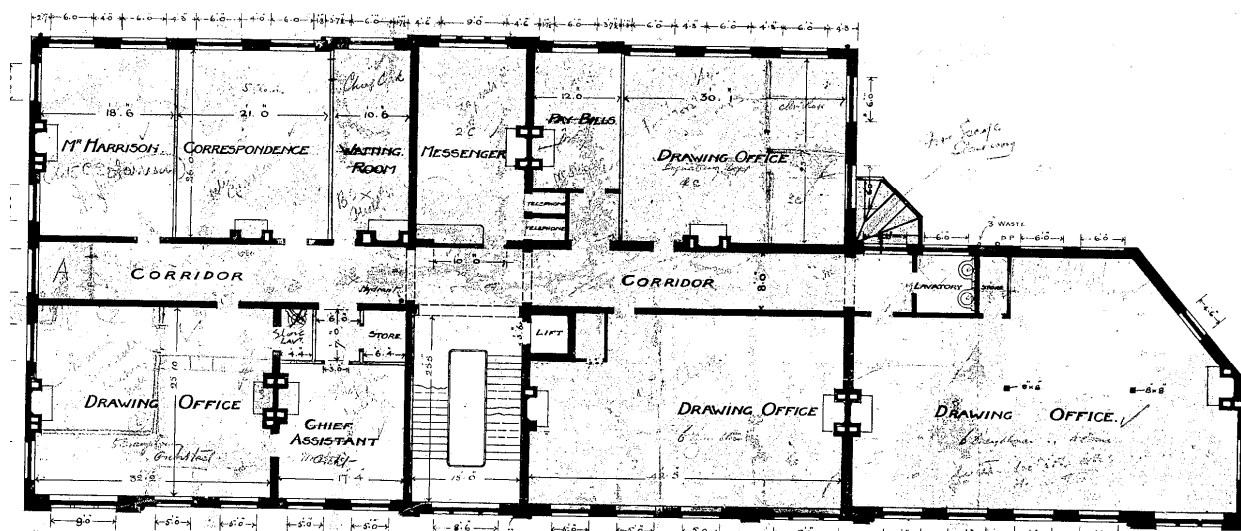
1904 first floor plan of Kings House (N is to the right)
